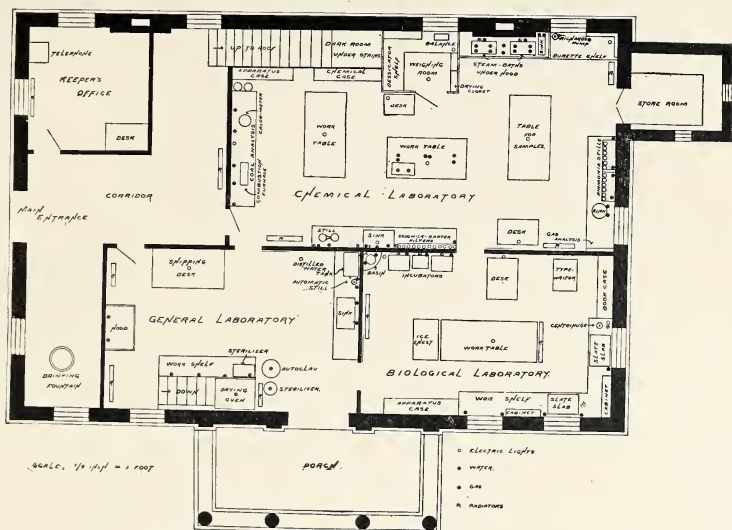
MT. PROSPECT LABORATORY. FLOOR PLAN.
